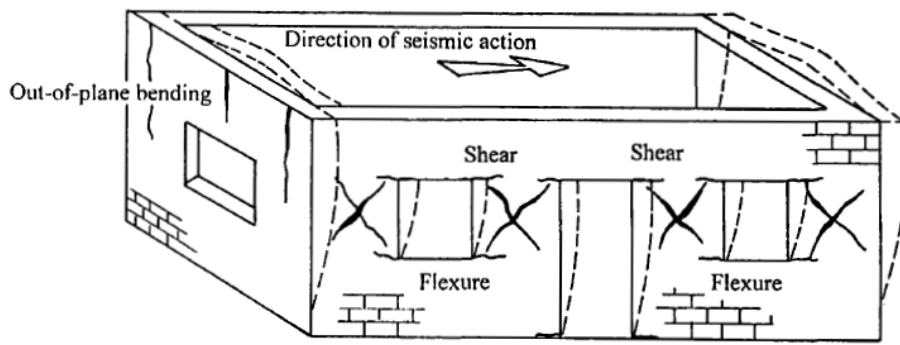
Deformation of the building and typical damage to structural walls [55]
